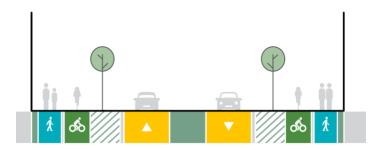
CFAF Outcome - New Crossing of SH1 at Dairy Stream indicative 24 m cross section
